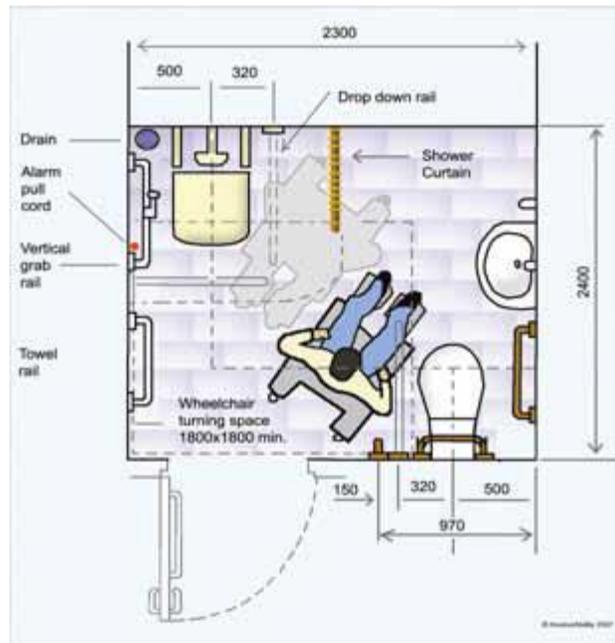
Typical bathroom layout for disabled people [NID, Ahmedabad, 2016]
